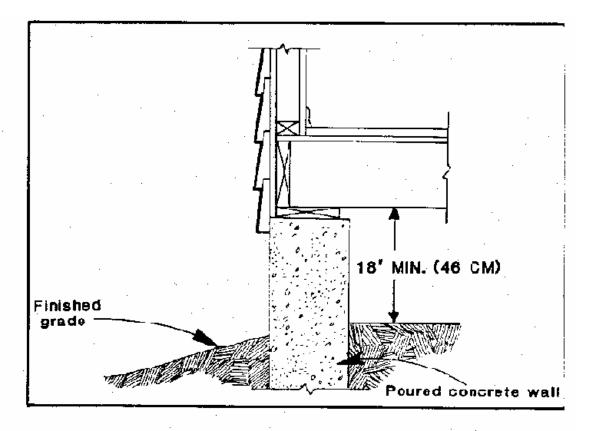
Poured Concrete Foundation Walls or Piers. (Such areas are easily inspected and offer protection against hidden termite infestations.)
